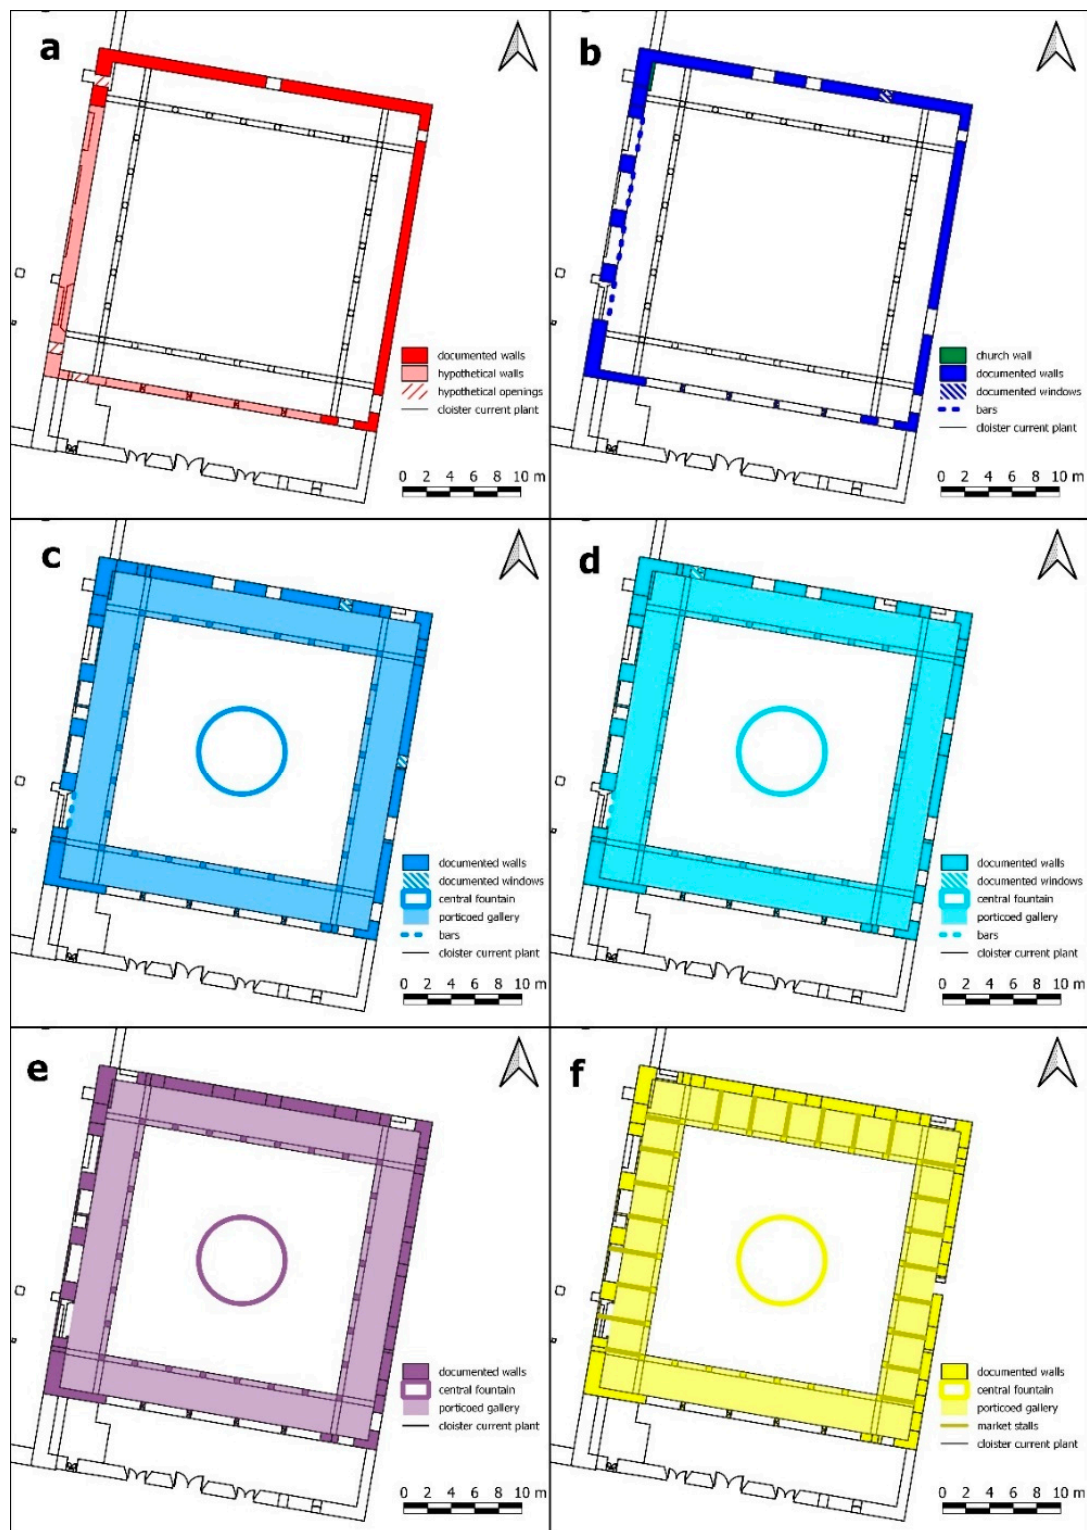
Evolution of the cloister: (a) original building, circa 1588; (b) first reform of the cloister encouraged by the construction of San Diego's Church attached to its flank W, from 1623 to 1716 (ending year); (c) remodeling because of the addition of a porticoed gallery with arcades, during 17th century; (d) light reforms from the 18th century; (e) remodeling due to the fact of the Spanish confiscations and the implementation of a schnapps factory in its environment, from 1835 and during the rest of the 19th century; and (f) transformation for the market's adequacy, circa 1940.
